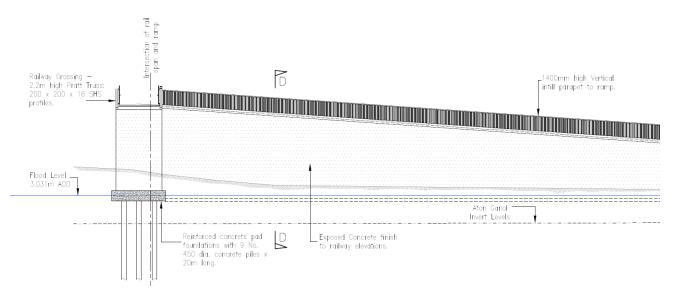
Proposed western approach to bridge over the railway line (Bridge 2) - south
